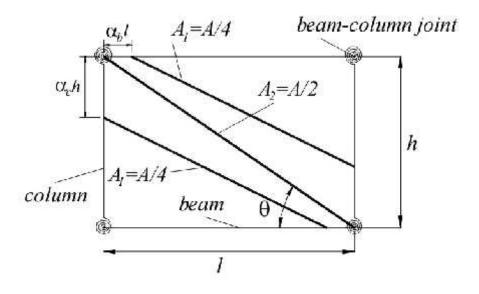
Concrete masonry-infilled steel frame model Ei-Dakhakhni et al
